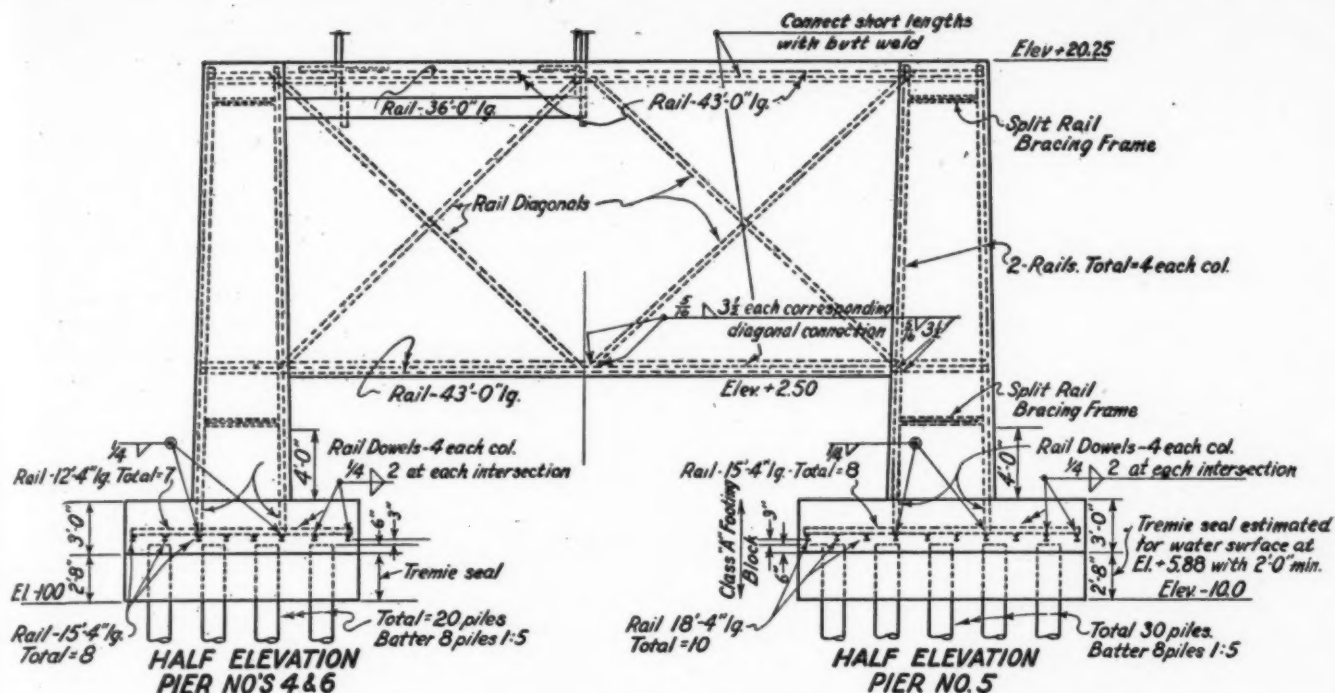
Pier and bent details of Eureka Slough bridge showing use of light rails for reinforcing
